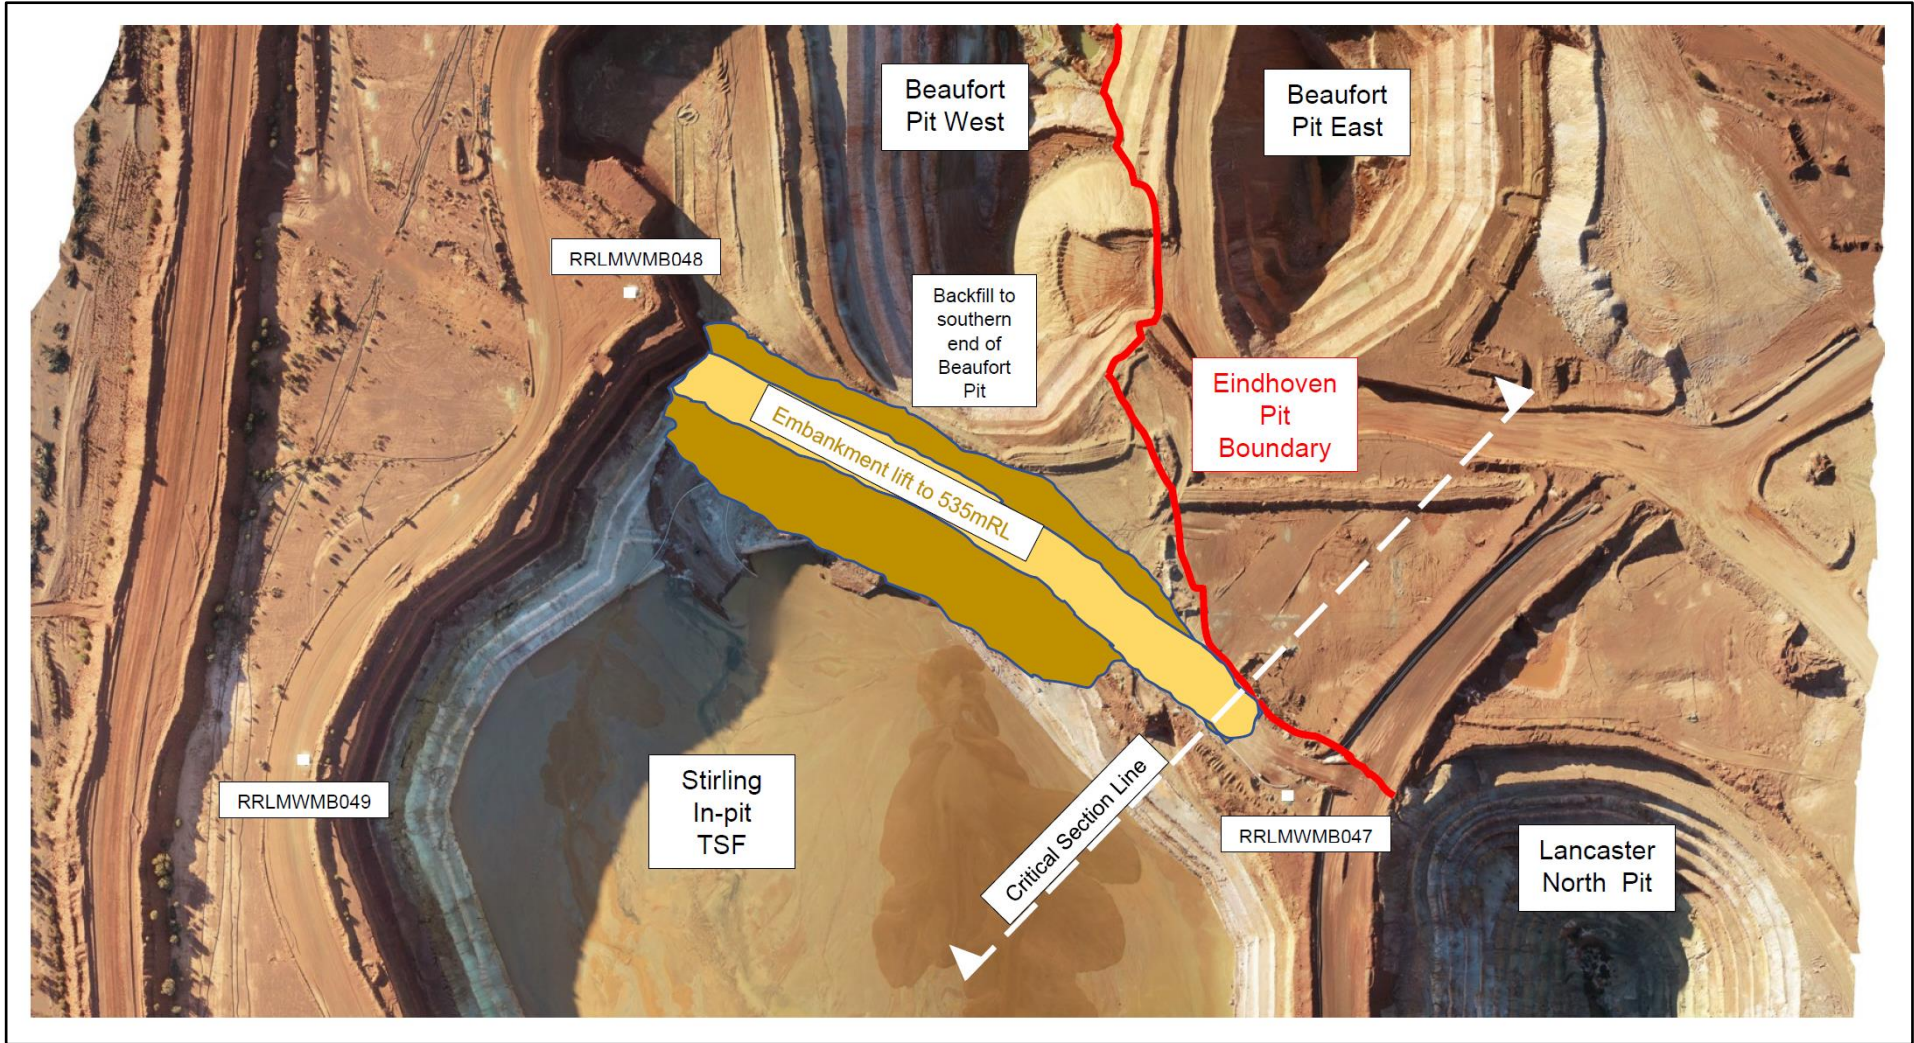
Existing Stirling in-pit TSF showing adjacent pits
